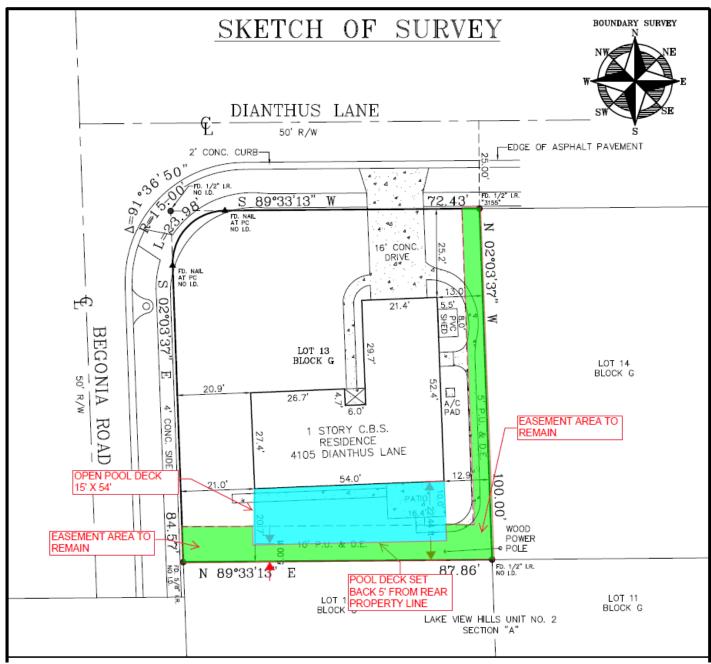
Copy of proposed pool plan area 15 feet by 54 feet open pool deck with a 5-foot set back from property line (highlighted in blue).
